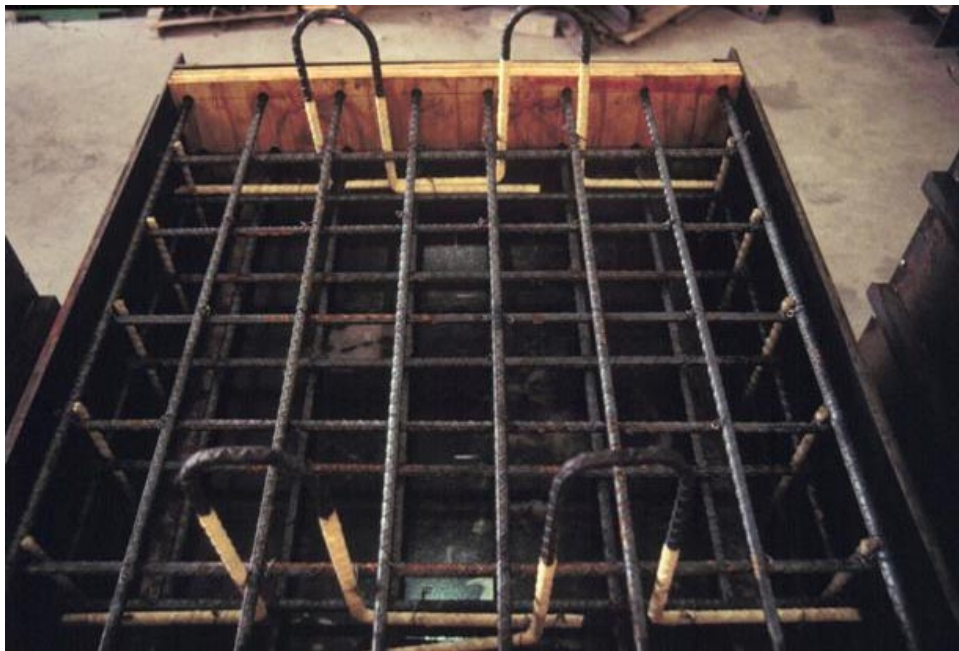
Reinforcing Steel in the Forms Prior to Concrete Placement – Typical Specimen.
